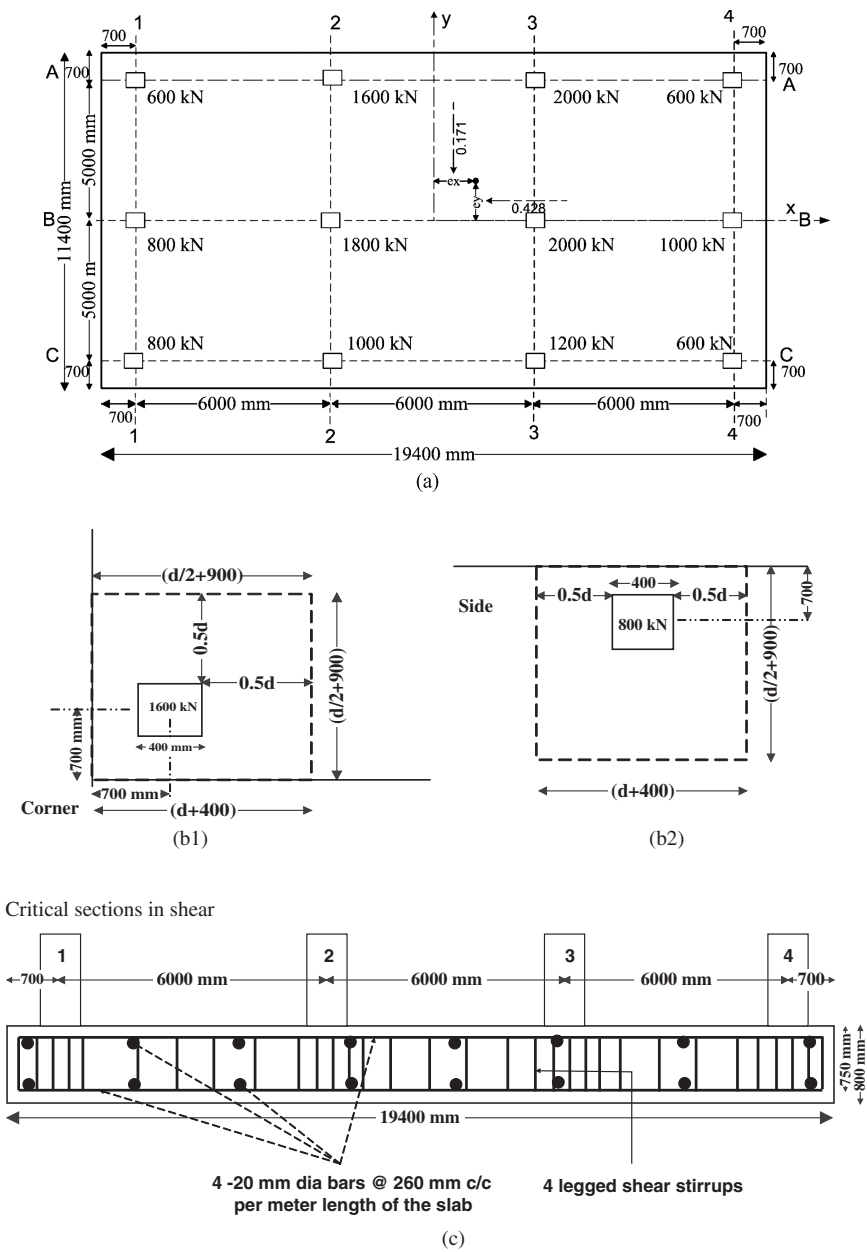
C.19 Raft layout and column loads; (b1) critical section in shear; (b2) critical section in shear; and (c) details of reinforcement along the longitudinal section (Example 12.7).
